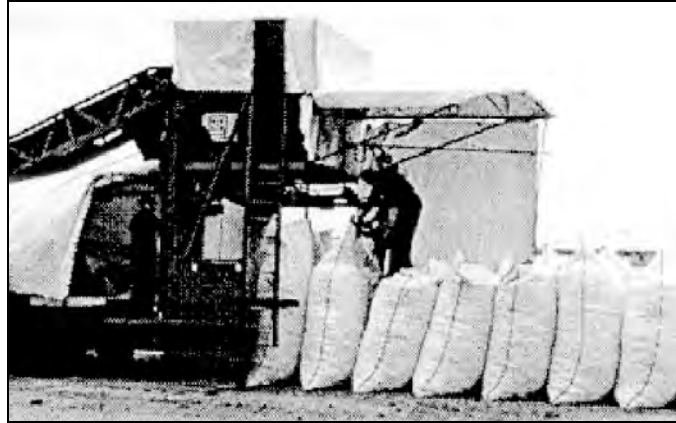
Batch plant for filling numerous geotextile containers on-site.⁽⁴³⁾
